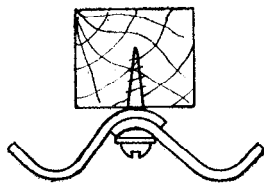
FIXING CORRUGATED ASBESTOS — CEMENT SHEETS
